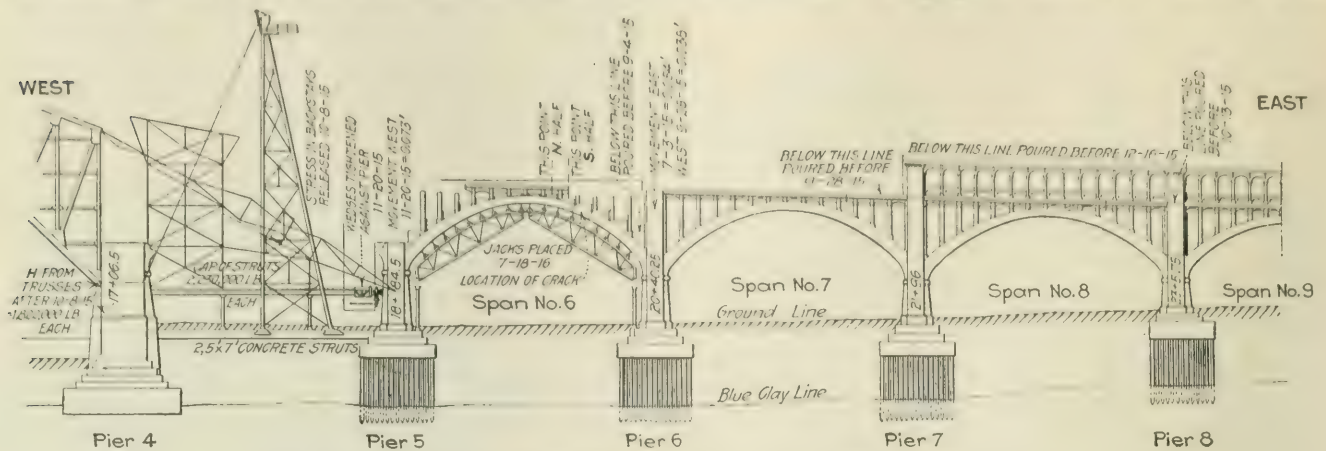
CONDITION OF ERECTION AND LOADING OF CRACKED ARCH
